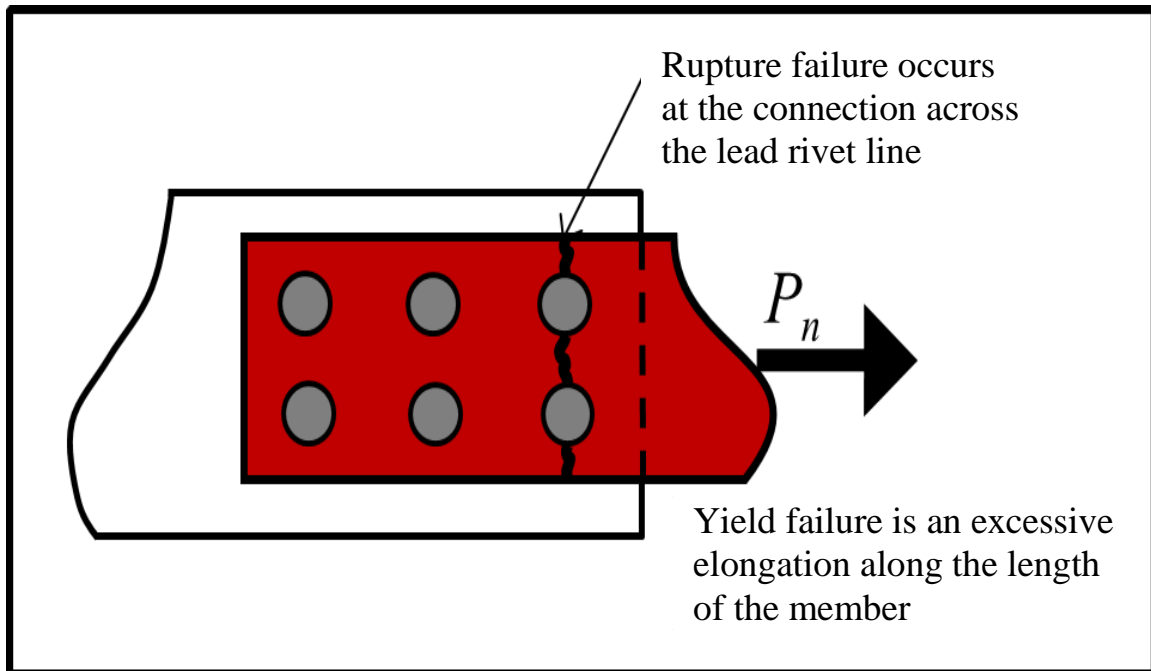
Member Yielding and Member Fracture (modified from AISC Tools Core Teaching Aids, aisc.org)
